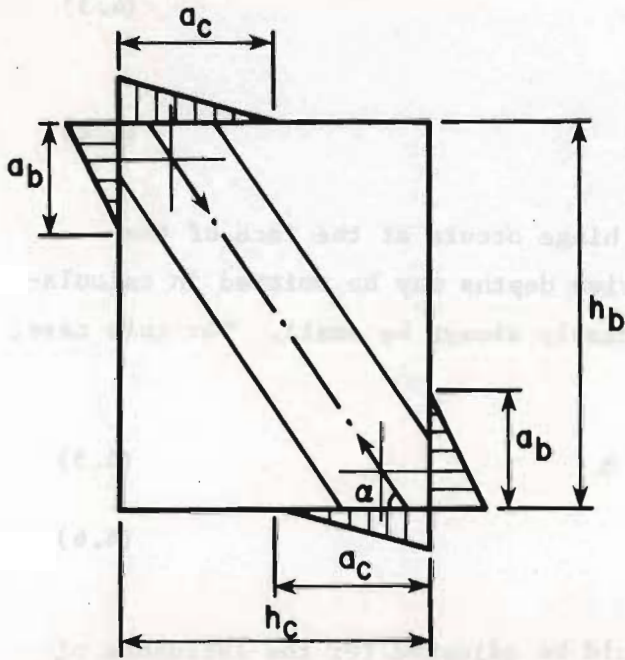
Terms needed for calculation of strength of non-hinging joints at compression strut failure
